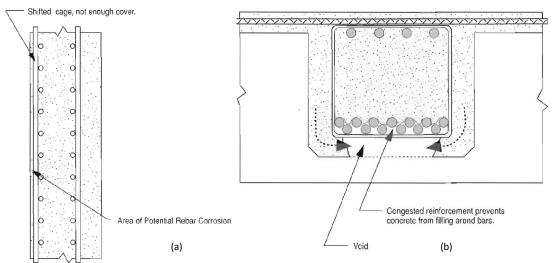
Illustrations of Improper Reinforcing Steel Placement: (a) Shifted Cage Causing Inadequate Concrete Cover. (b) Congested Reinforcement. (Emmons, 1993)
